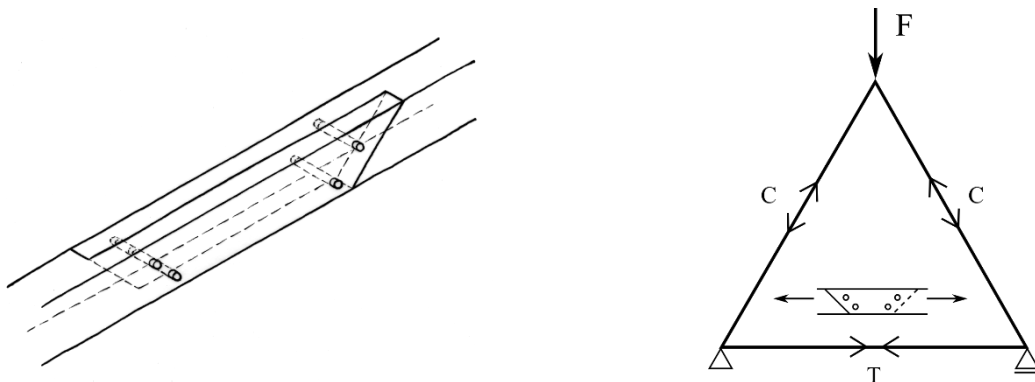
Lapped scarf joint with inclined faces (left) in a typical structural truss (right) is loaded in tension which is the most demanding type of loading of the joint
